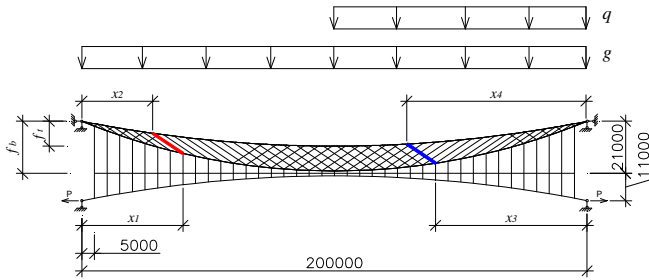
Design scheme of cable truss q – imposed load; g – dead load; f_b – bottom chord camber, f_t – top chord camber; x_2 and x_4 – distance from the pylon to the connection of web element and top cord; x_1 and x_3 – distance from the pylon to the connection of web element and bottom cord
